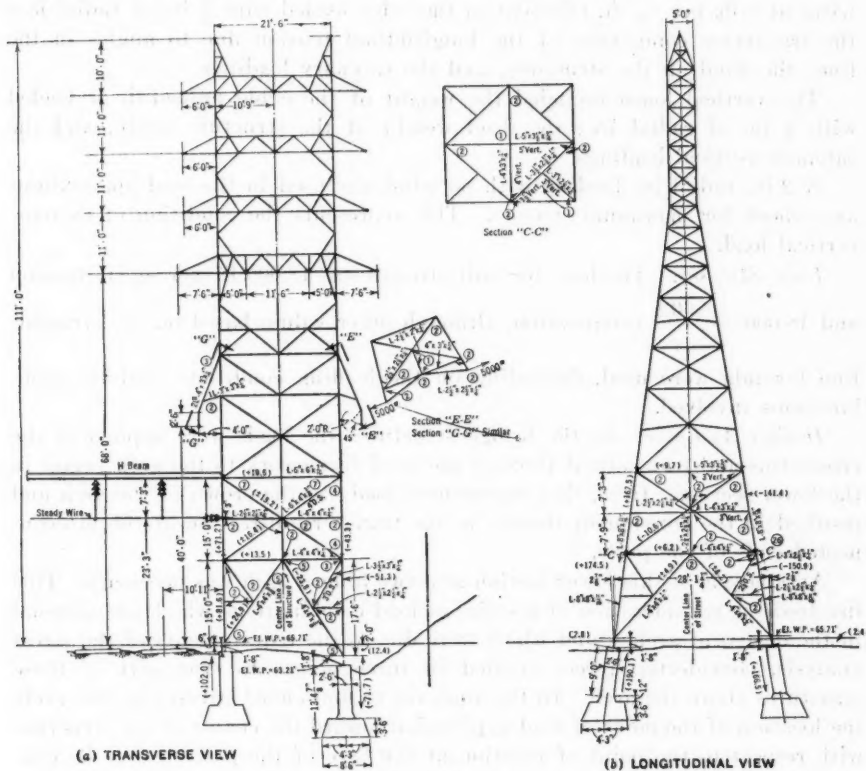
GENERAL DIMENSIONS OF A TYPE M TOWER STRUCTURE.
